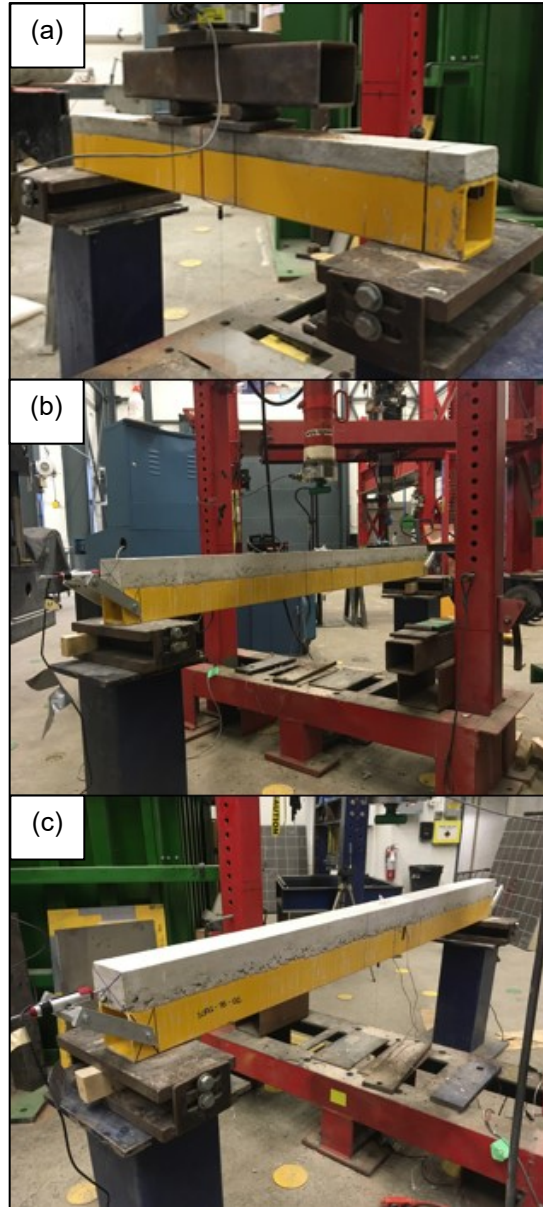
Pictures of four-point bending test set-up for the slab specimens: (a) preliminary slab specimen SSB1-35-01, (b) and (c) full-scale slab specimen SSA2-75-02
